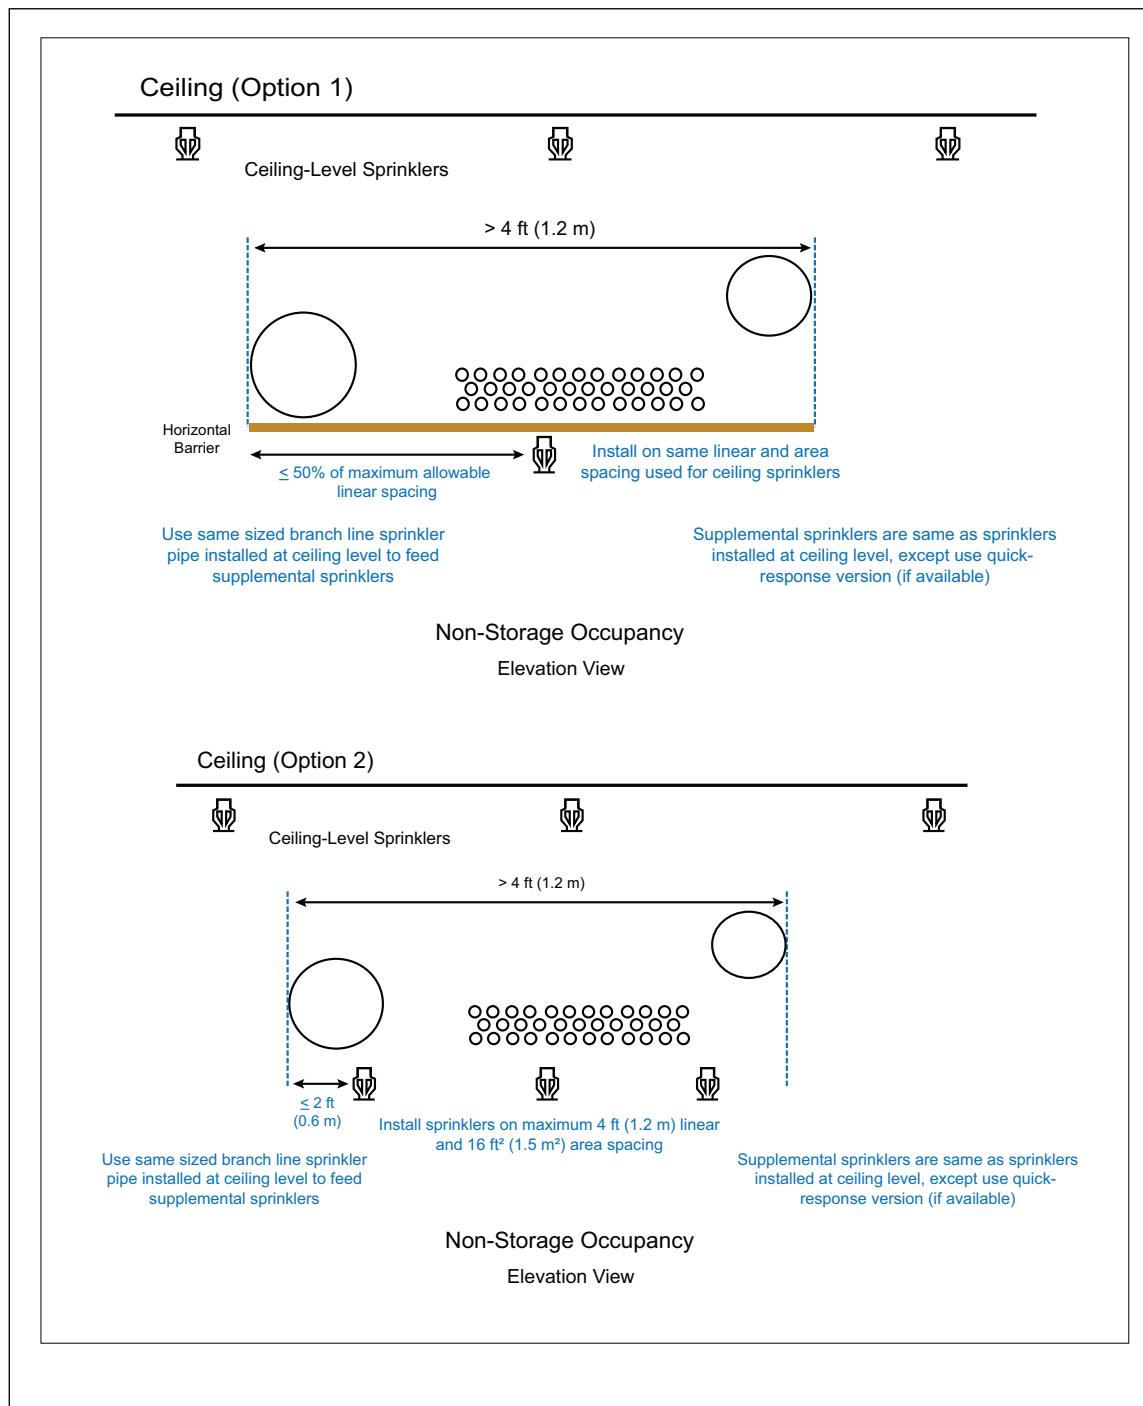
Supplemental ceiling-level sprinklers installed below non-flat or non-solid, grouped obstructions over 4 ft (1.2 m) wide.
